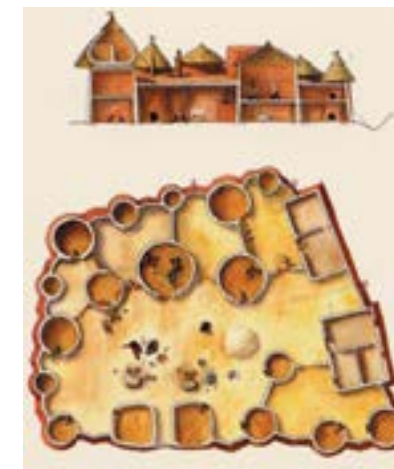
PLAN AND SECTION OF A TYPICAL HAUSA COMPOUND
